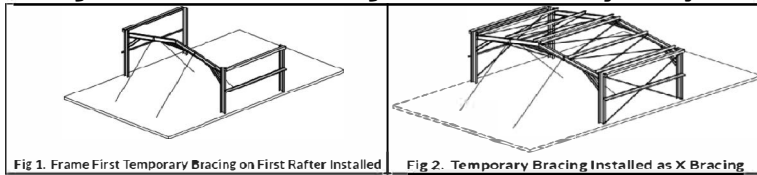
Frame First Temporary Bracing on First Rafter Installed
